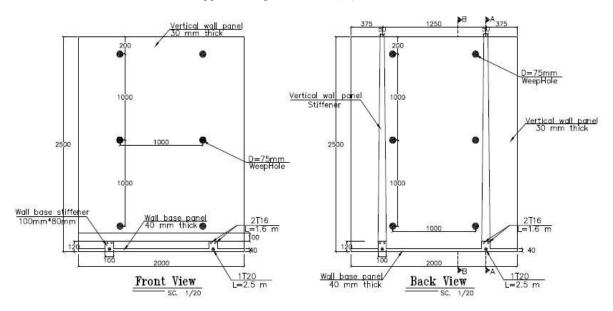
Front view and back view of the precast UHPFRC cantilever retaining wall
